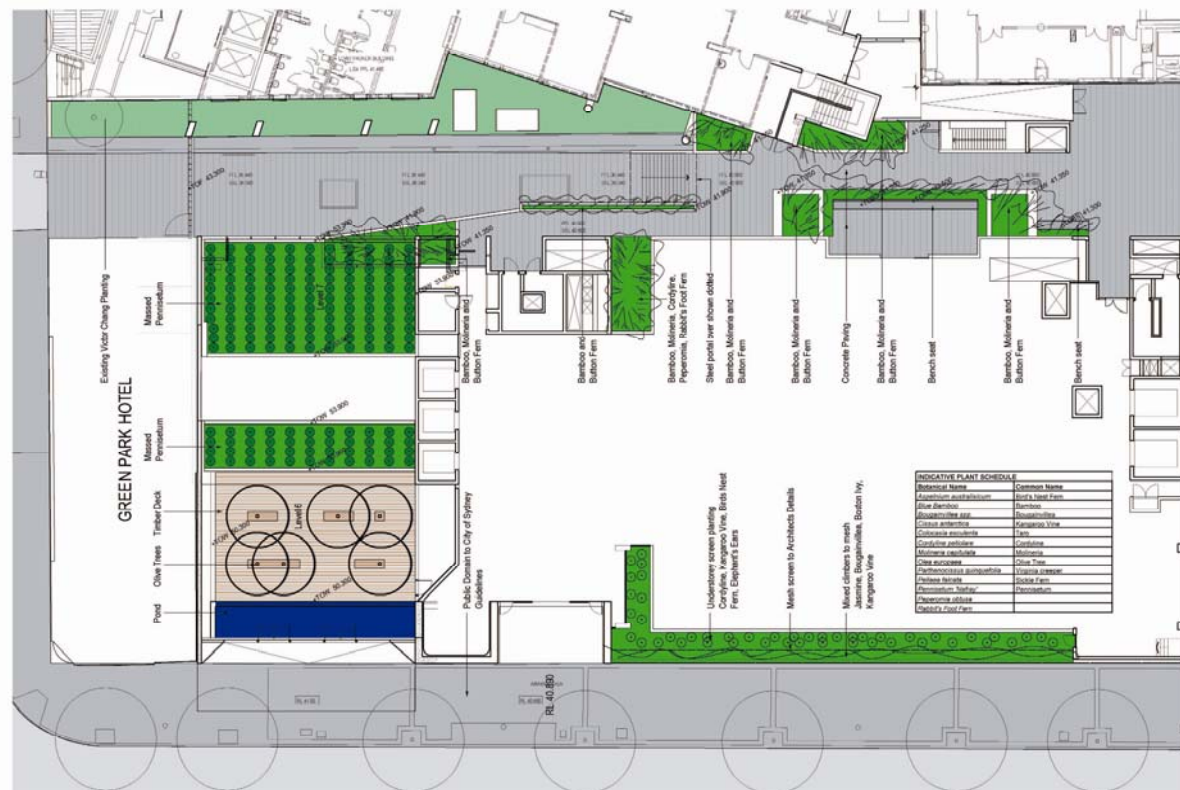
Chaplin Street Landscape Plan, prepared by 360 Degrees
